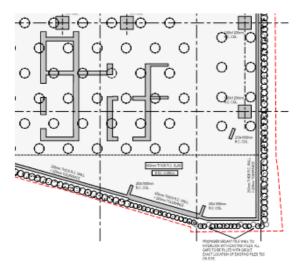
450mm Secant piled wall on the south side of NCC; interlocking detail between existing piles and proposed secant piled wall
